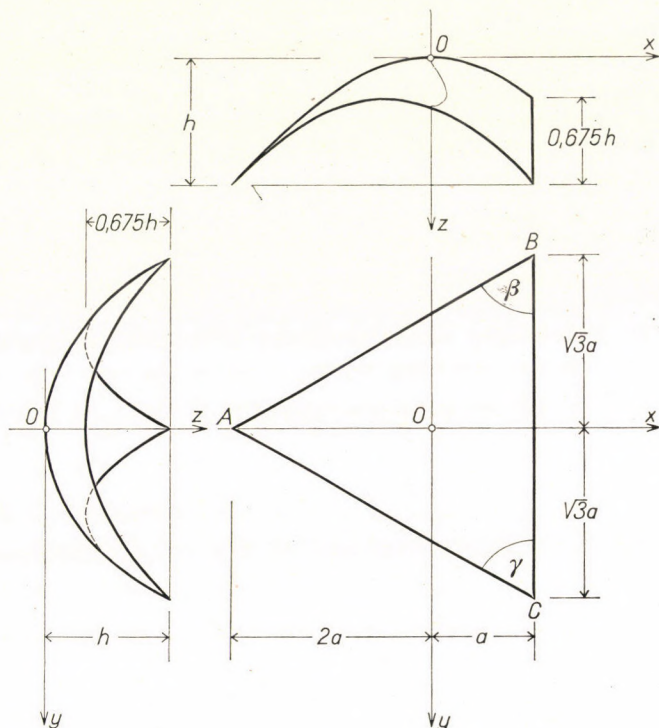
Calotte shell constructed over an equilateral triangular plan-form
